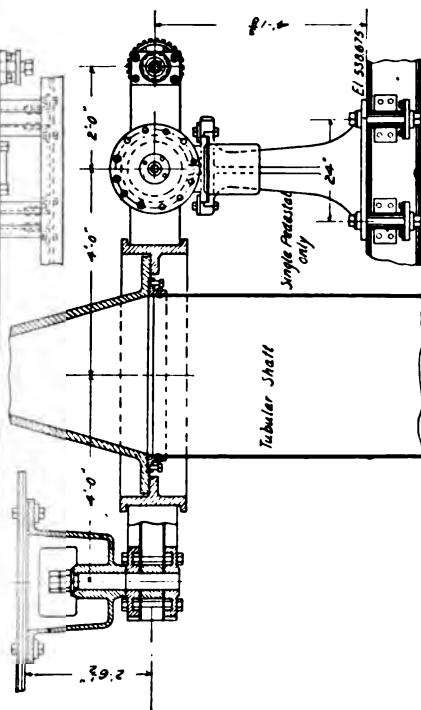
Brake on Main Shaft under Thrust-Bearing Girders.
